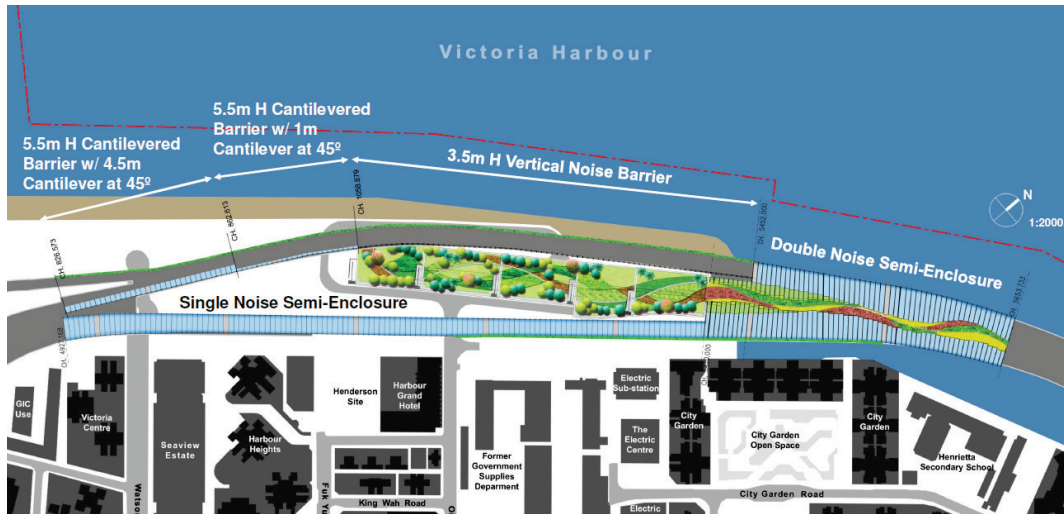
Extent of Green Panel of Cantilever Noise Barrier at New Eastbound Bridge
